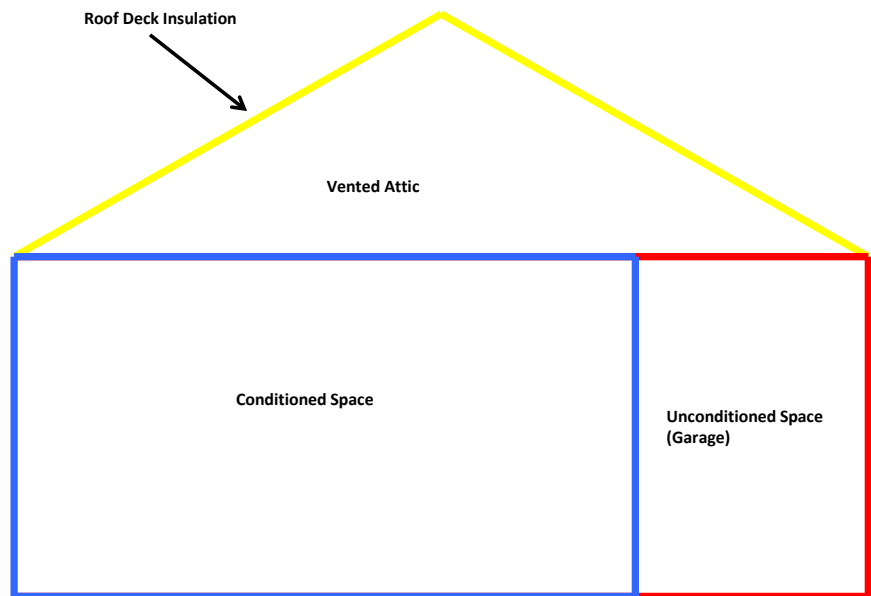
House with attic insulation extending over conditioned and unconditioned spaces
